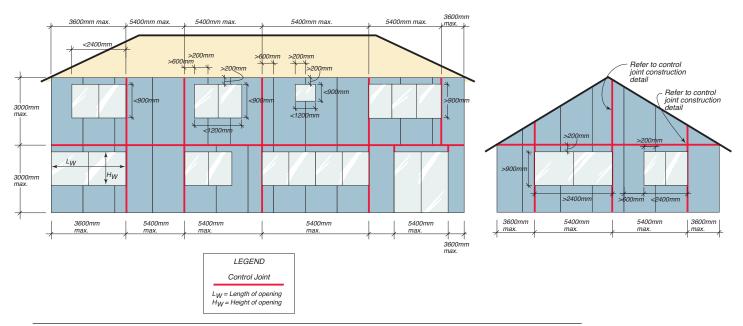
Sheet Layout for Single Storey Over 3000mm Height
